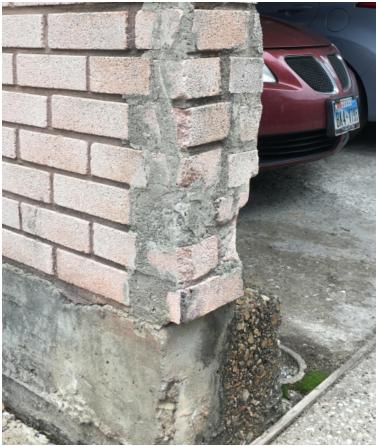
Spalling of Brick on Southeast corner of Building 3
